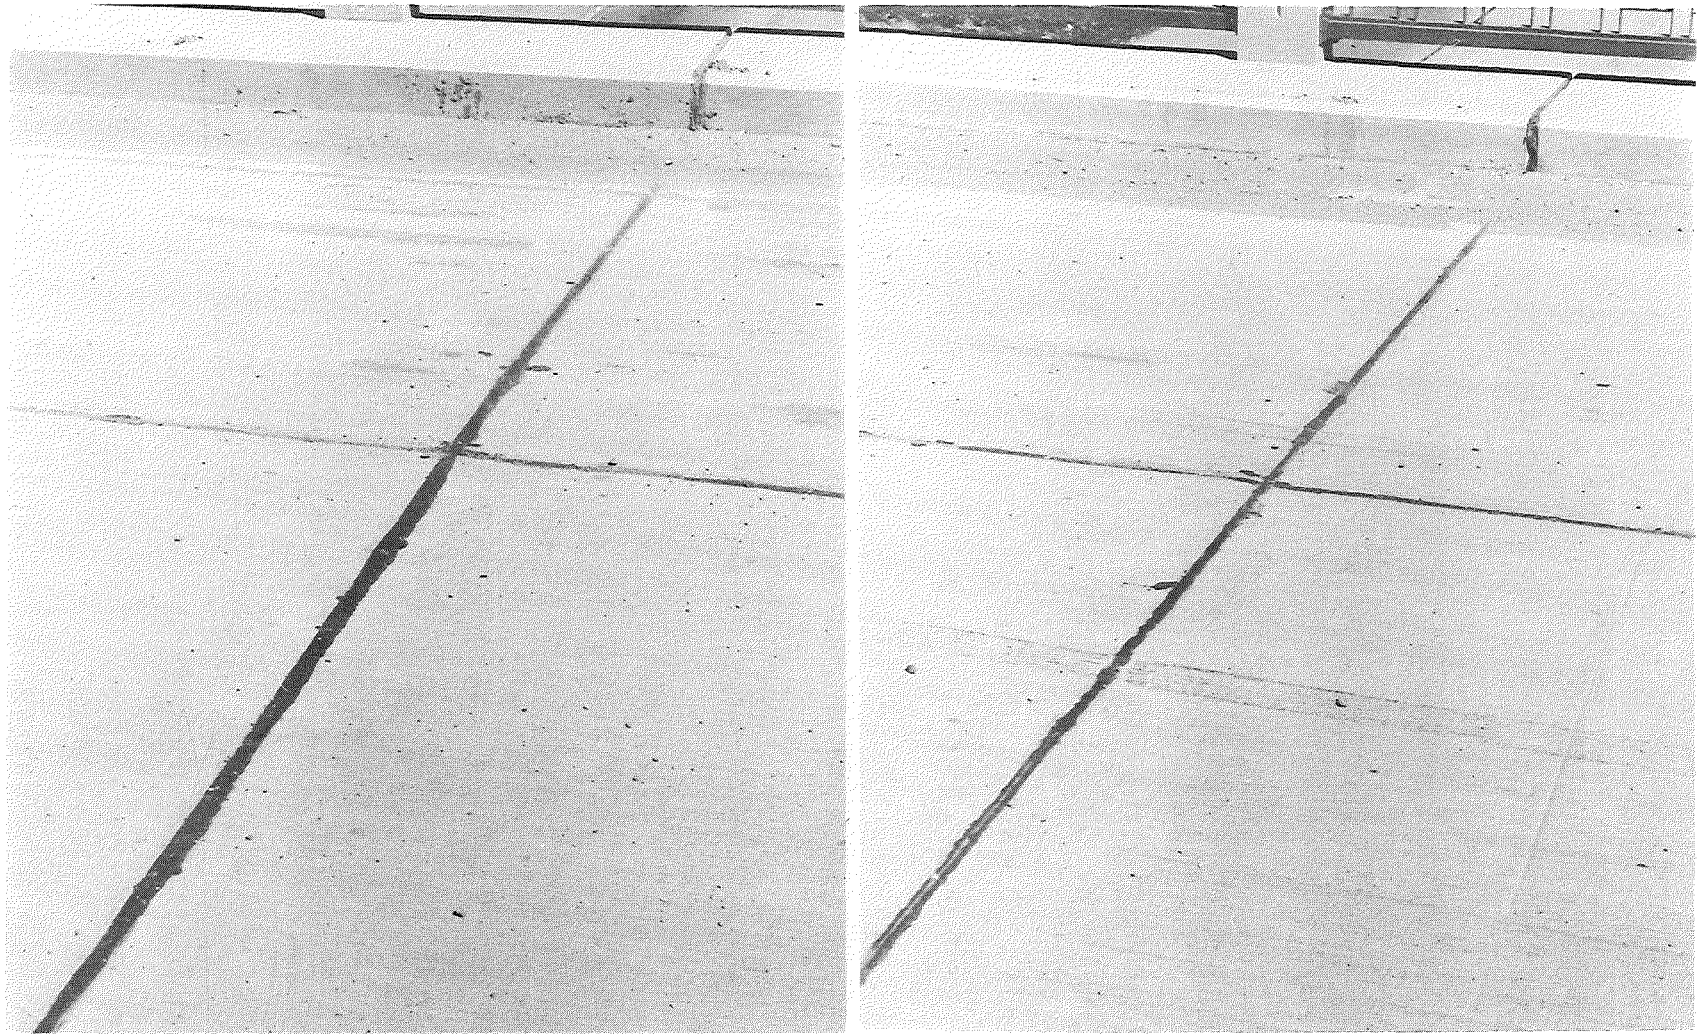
Sutton Road overpass on US 12 (B2 of 38-7-14), built at same time as nearby Dettman Road overpass, but with conventional concrete deck. Good joint sealing prevented leakage (4-15-58).
